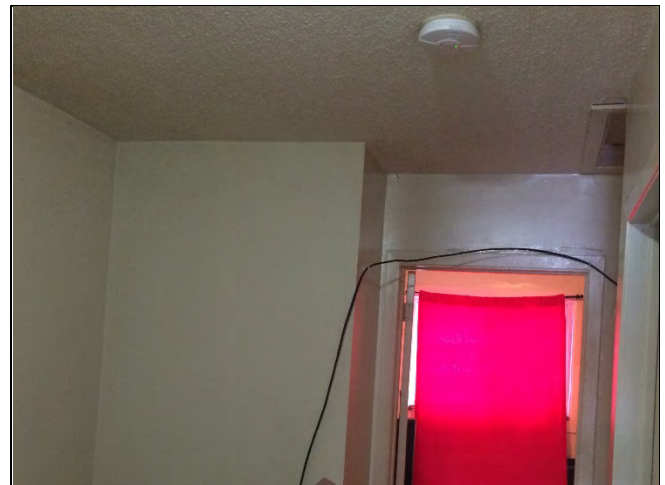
Asbestos-containing drywall joint-fill compound and stucco observed on walls and ceiling at 518 Fort Town Drive.
